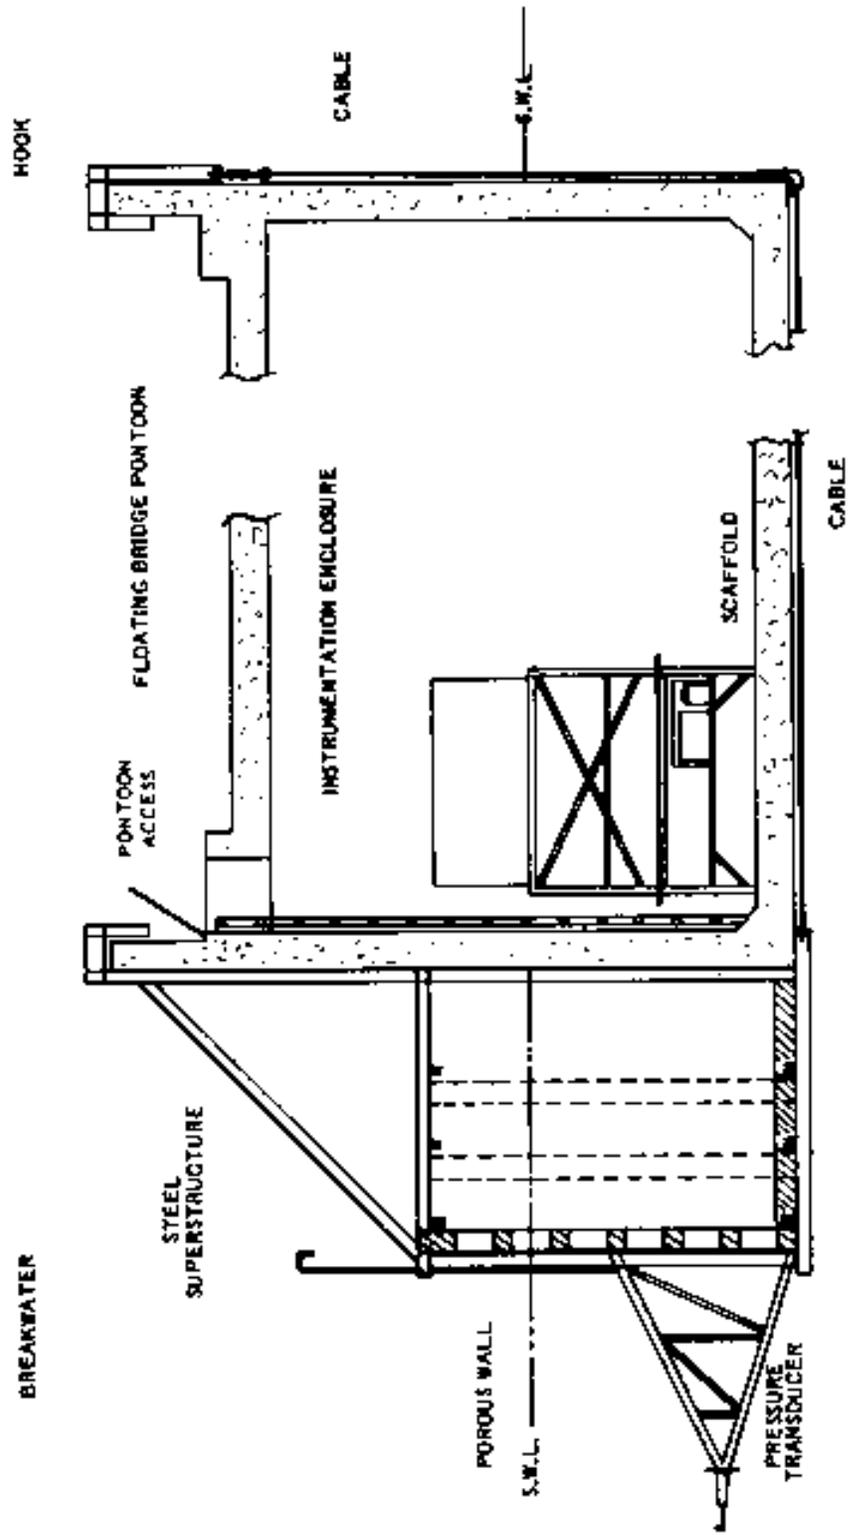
Cross-Section A-A Of Breakwater Attached To Floating Bridge Pontoon.
